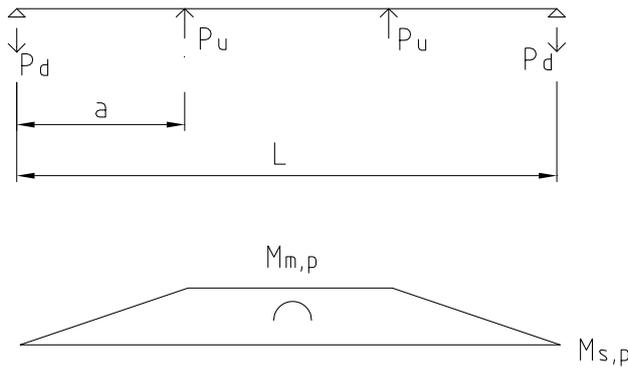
Structural schematisation of the box girder subjected to prestressing forces
